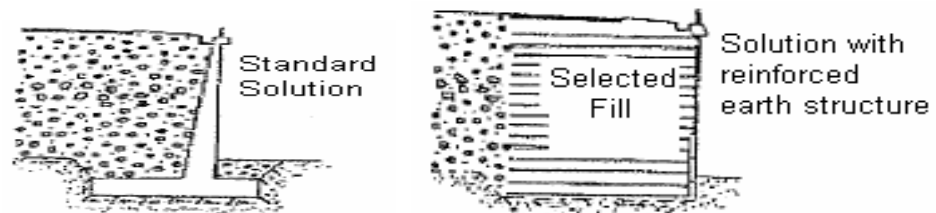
Solutions by reinforced earth method-retaining walls (Craig, 1987)
